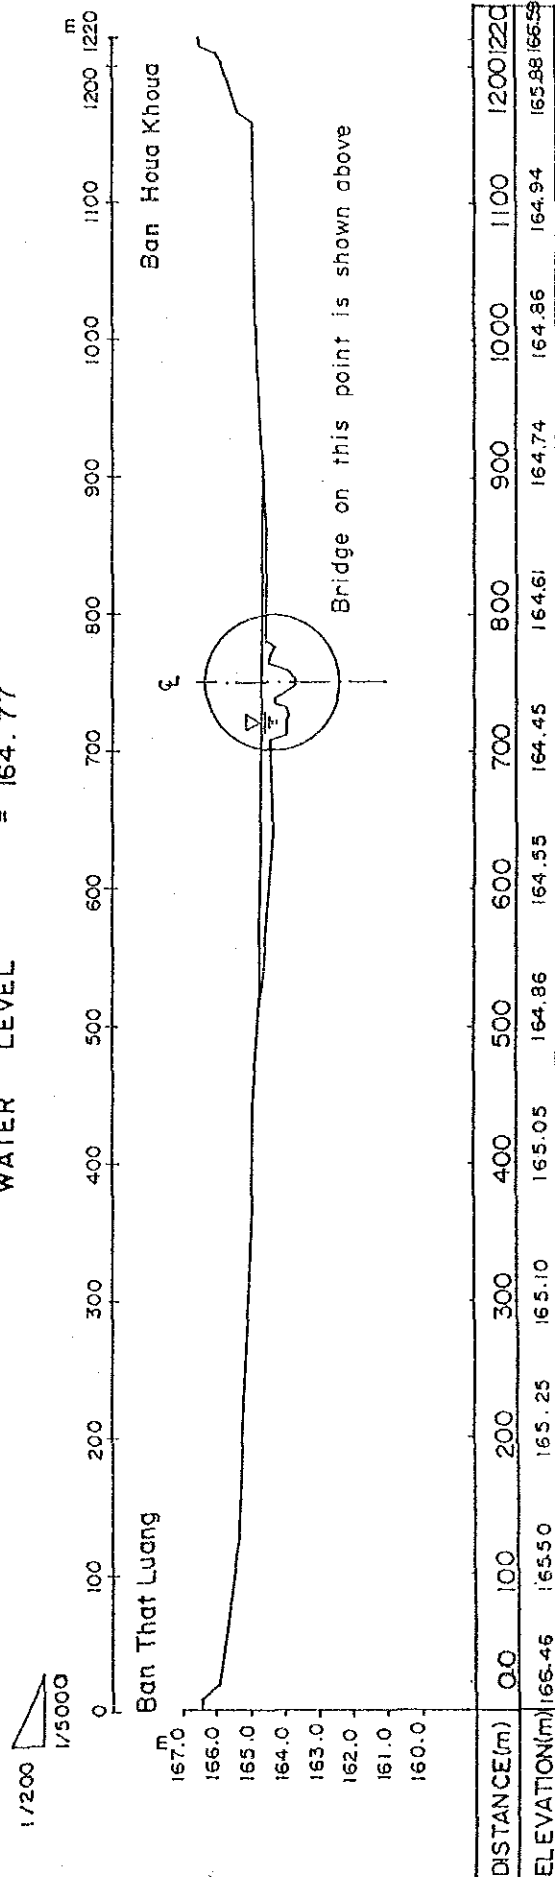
CROSS SECTION AT NO.3 GAUGE
